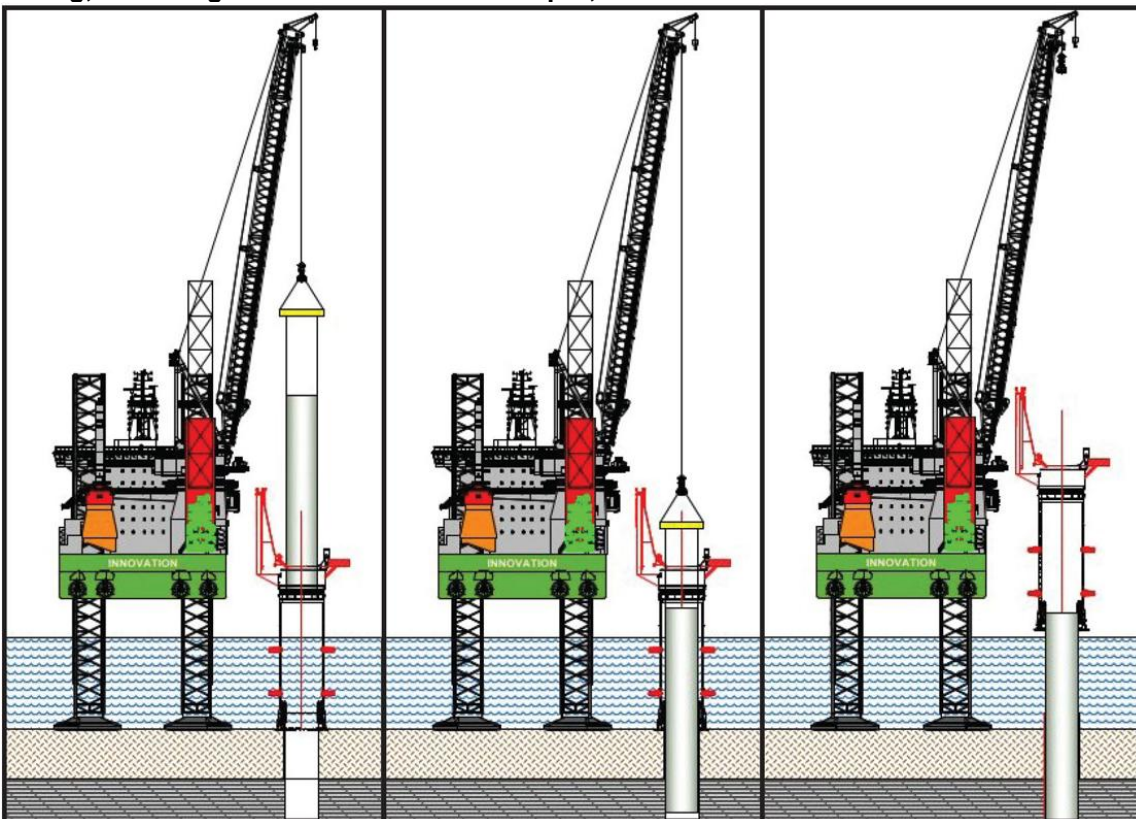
Installation of foundations (steps 4-6): 4. Insertion of monopile; 5. Grouting of monopile, 6. Removal of MODIGA.
